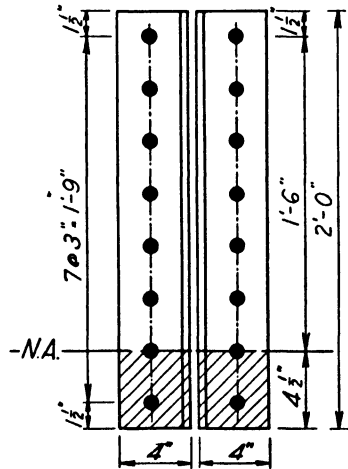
FLOOR-BEAM CONNECTION TO POST.
